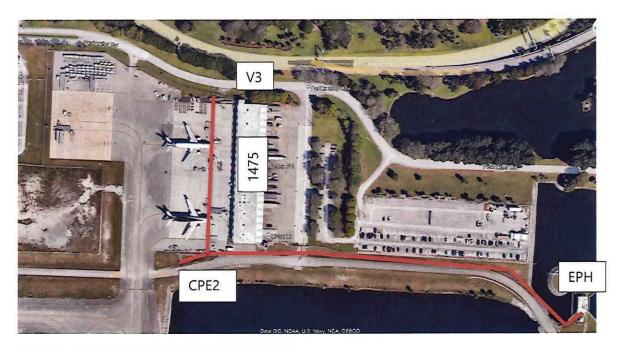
SITE GATE AND EAST PUMP HOUSE (EXISTING)
